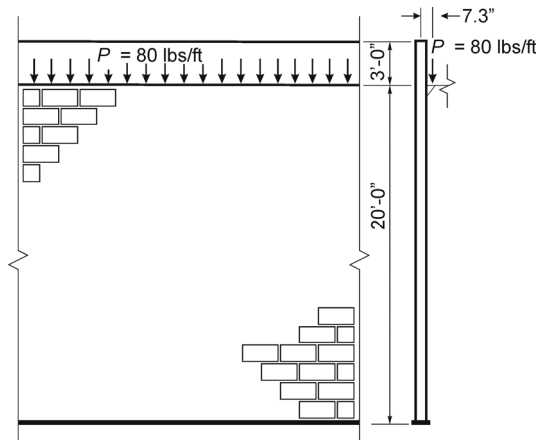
Masonry Wall Under Low Axial Loads: Front and Side Views
